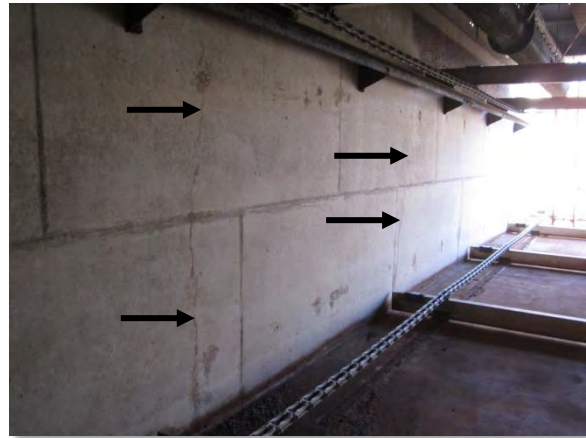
Typical vertical cracks spaced every few feet along length of north wall.
